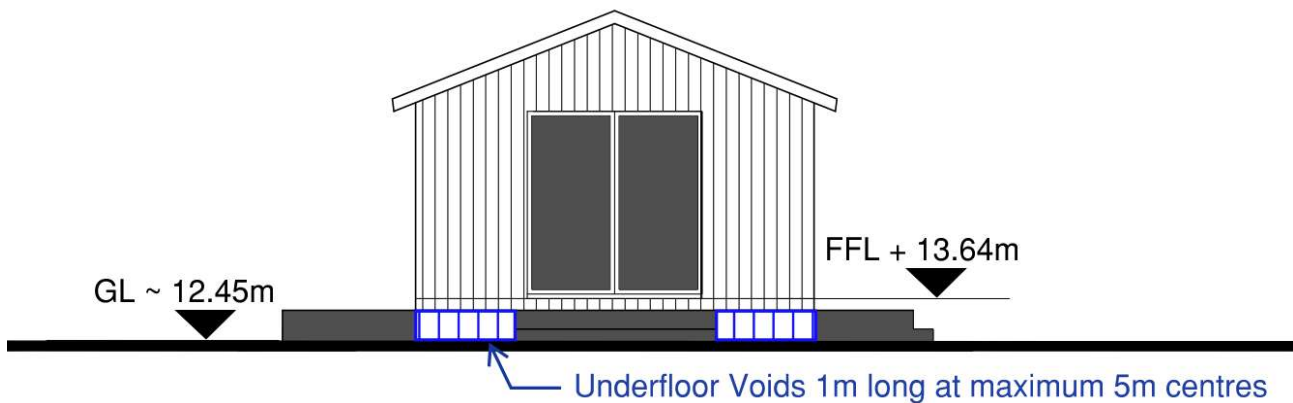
SECTION THROUGH PROPOSED OUTBUILDING
